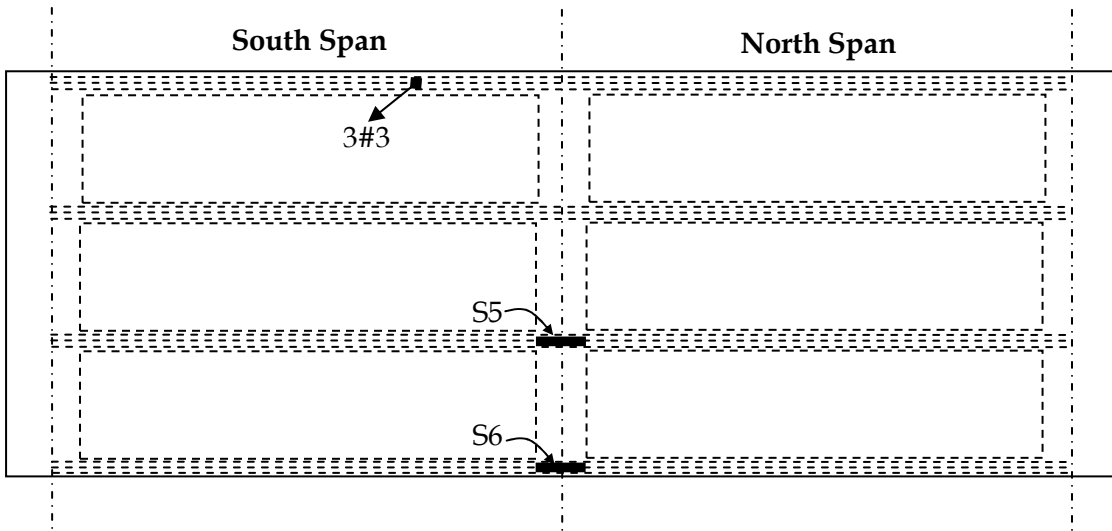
Arrangement of Concrete Strain Gauges and Loading Configuration for Specimen 3T2S
